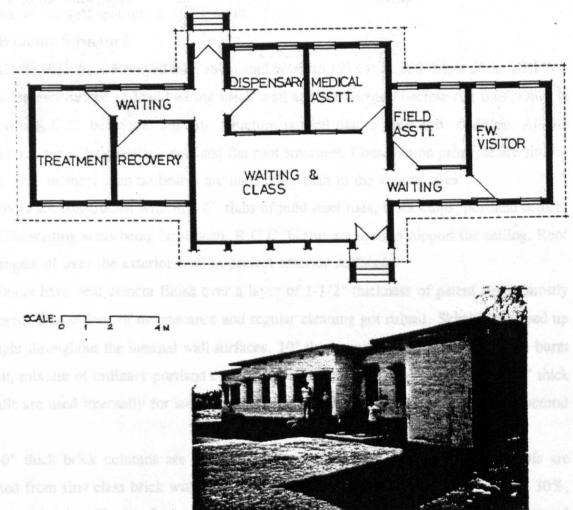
Plan of UHFWC Ph.33 A typical UHFWC with detached toilet and tube-well
